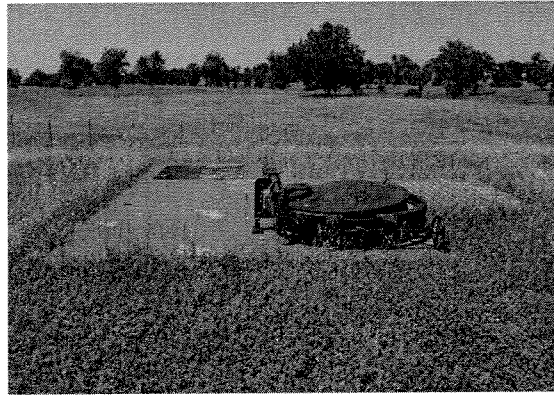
Fan Room for Test Stand No. 1 (Unit 127), Beta Test Complex, 1963-1964. Looking north. View of May 2005.
